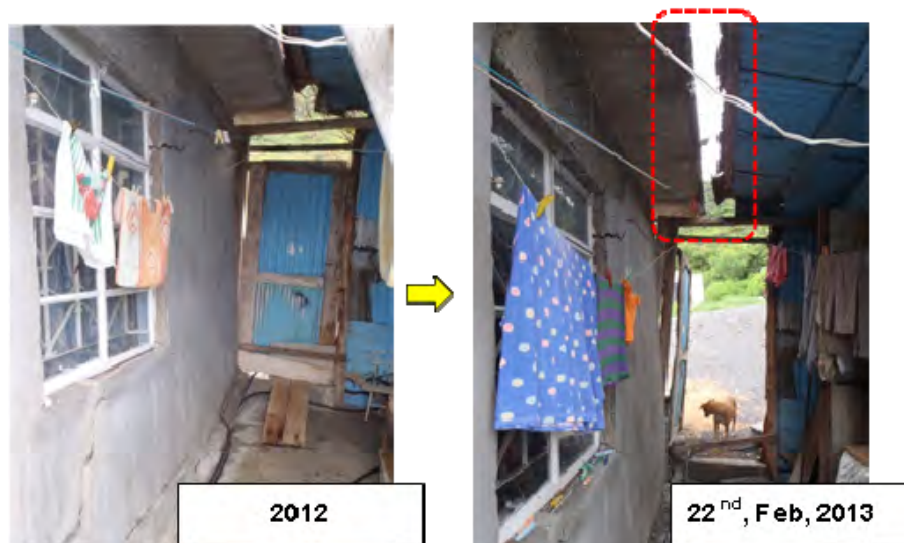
House (1) was Tilting as Result of Landslide Activity, Causing a Large Gap with the Neighboring House (source: JET)
